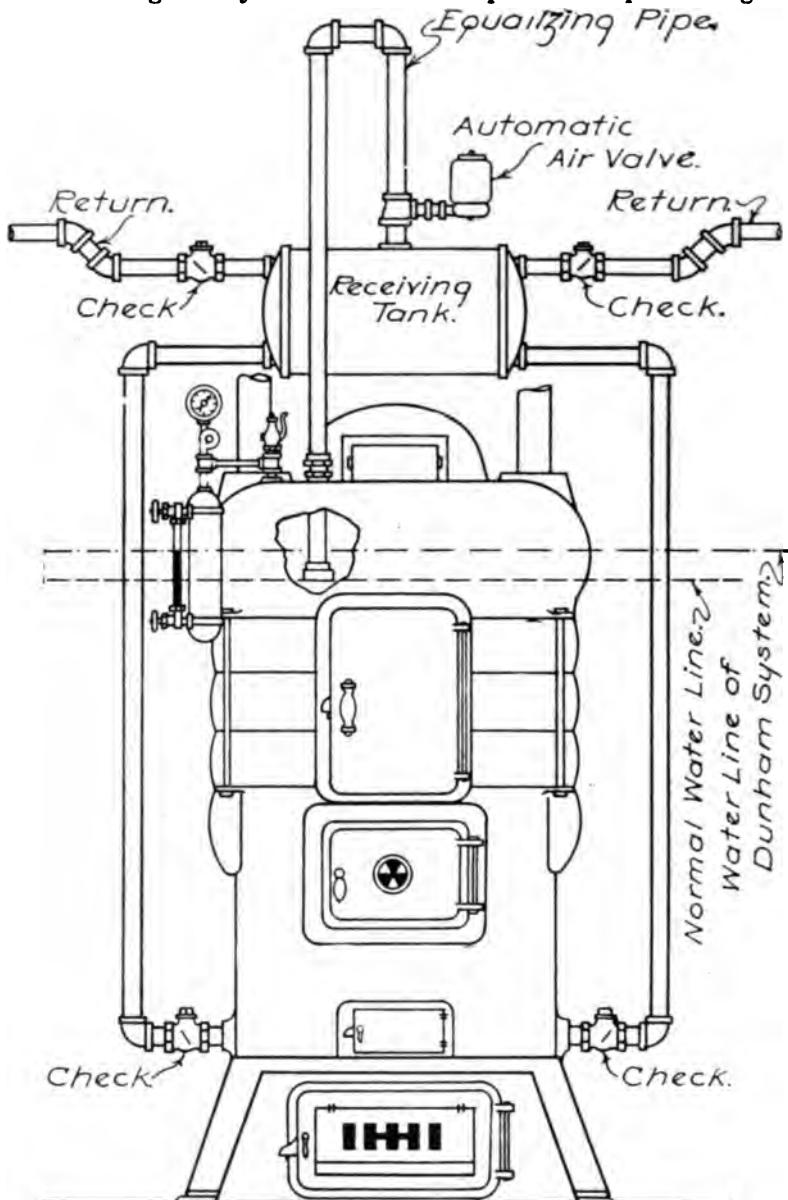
Connections to Boiler and Tank—Dunham System.
